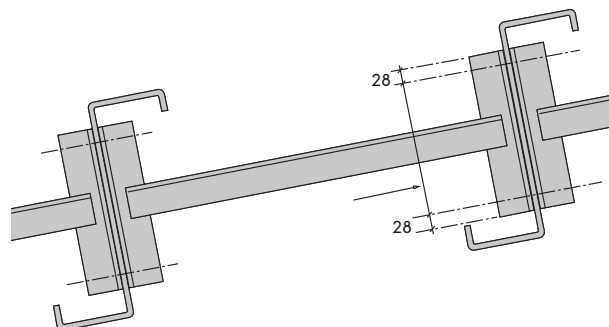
ASB strut made of 45 × 45 × 2 mm L section
